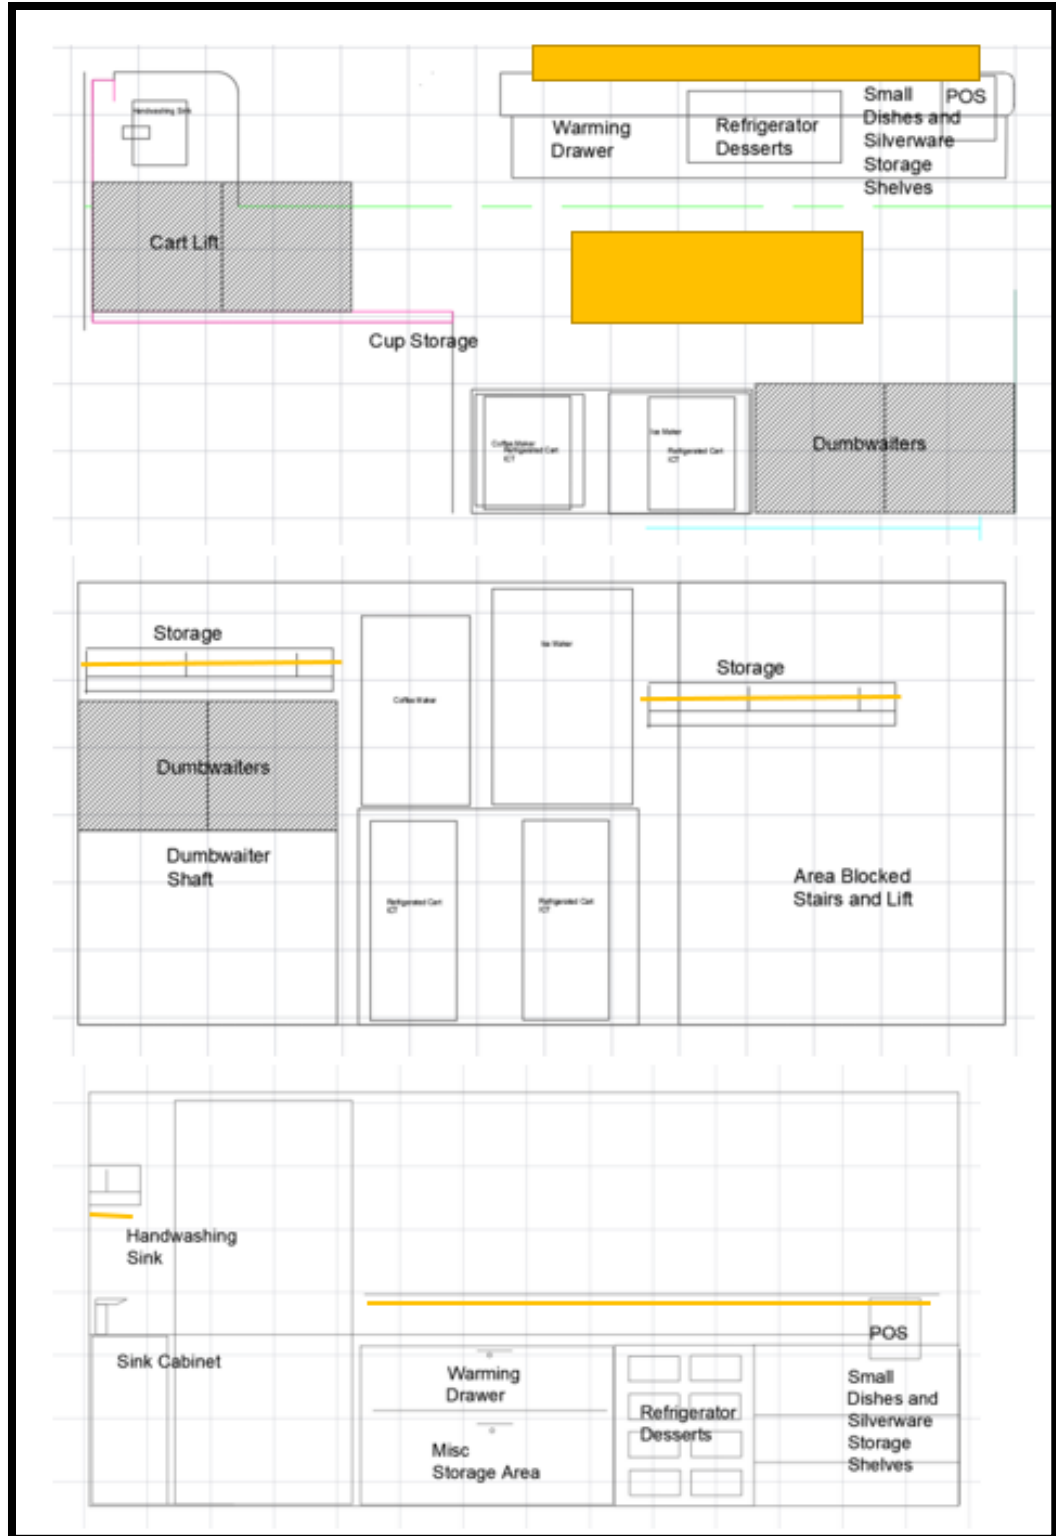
Servery Layout - Overhead and Strip Light General Locations
